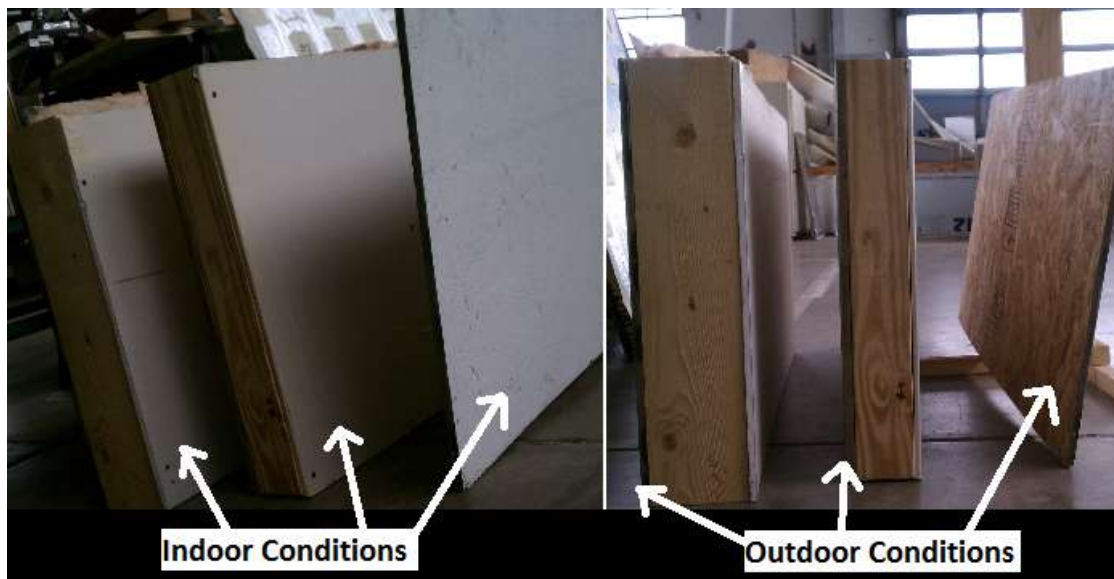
Indoor and outdoor conditions of the three specimen sizes
